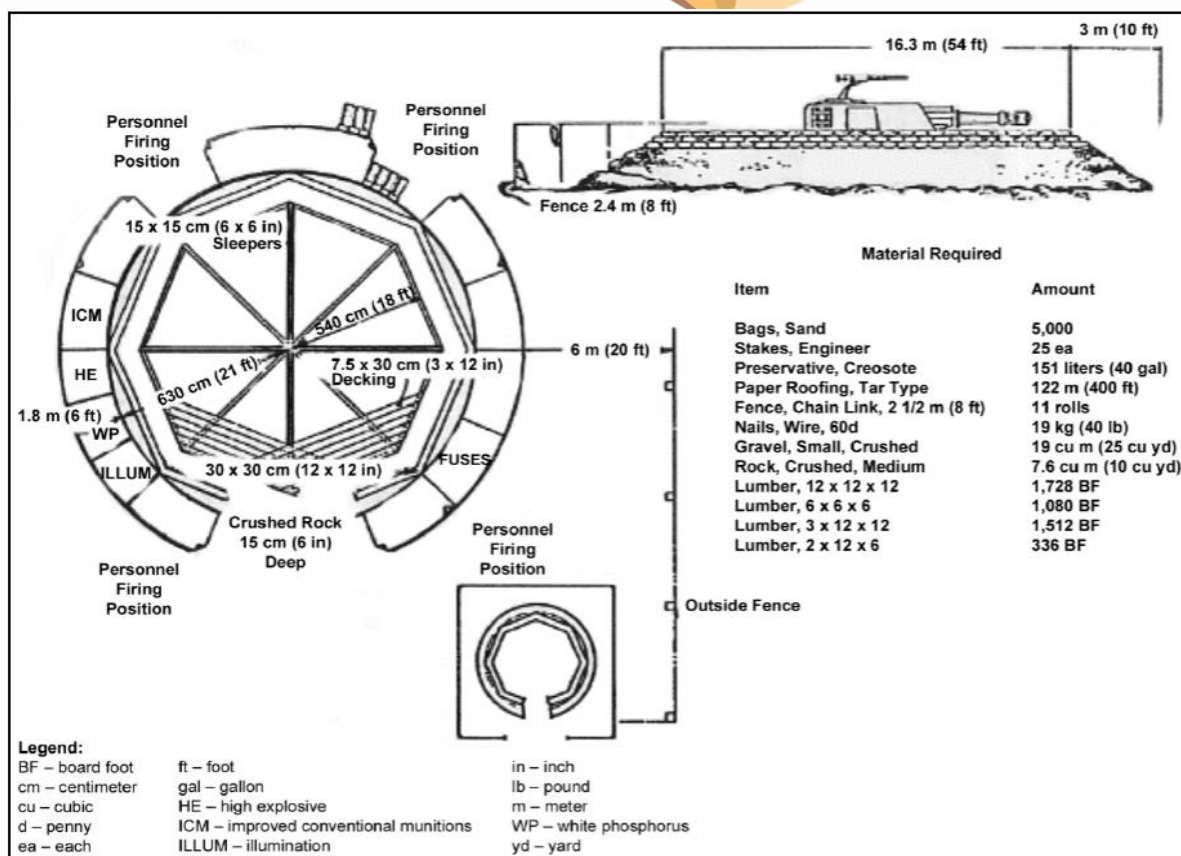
Towed howitzer emplacement (105-millimeter and 155-millimeter howitzer) completed emplacement)
